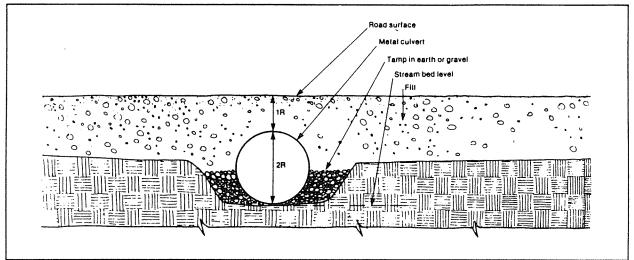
Culvert installation in streambed (Hynson et al., 1982).
